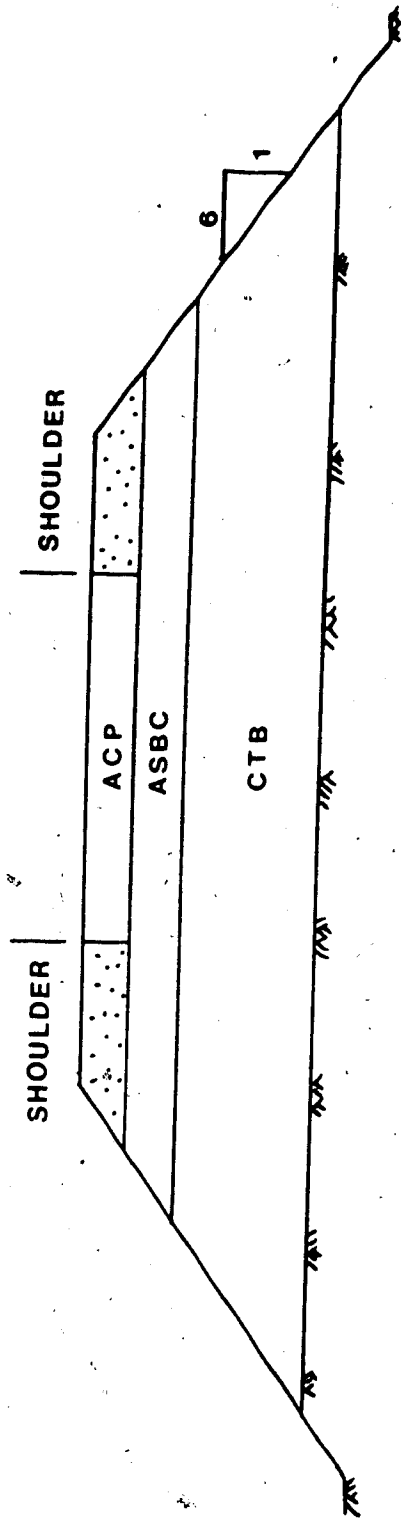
Typical Cross-Section Showing Elements of a CTB Pavement
